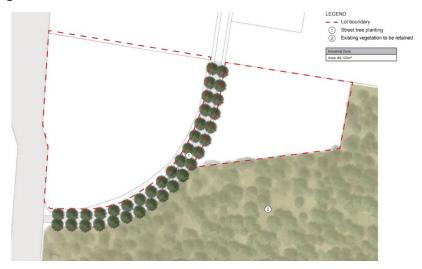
Landscaping impression of street planting within the north-west employment precinct (Landscape Master Plan Report, 2019)
